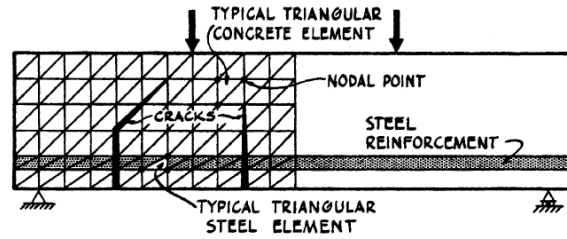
Finite element modelling of the reinforced concrete beam (Ngo and Scordelis 1967)
